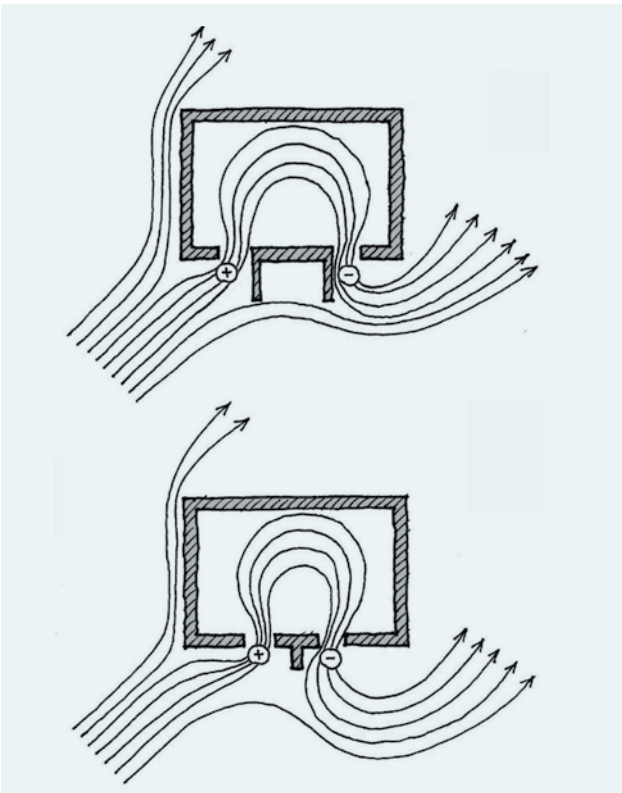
VENTILATION, WITH WING WALLS, IN ROOMS WITH ONLY ONE WALL FACING OUTSIDE AND TWO OPENINGS
